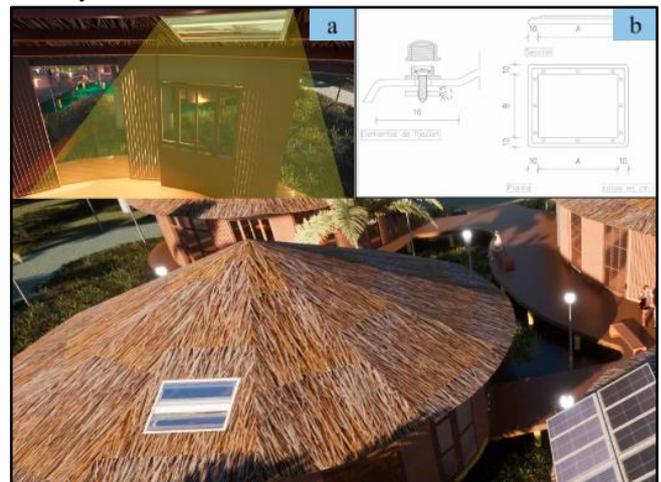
(a) Skylight in roofs, (b) Detail of skylight
